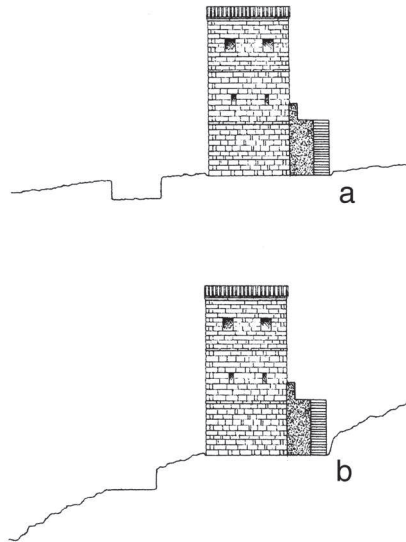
Reconstructed section through wall and fortification ditch on a) level ground and b) sloping ground.
